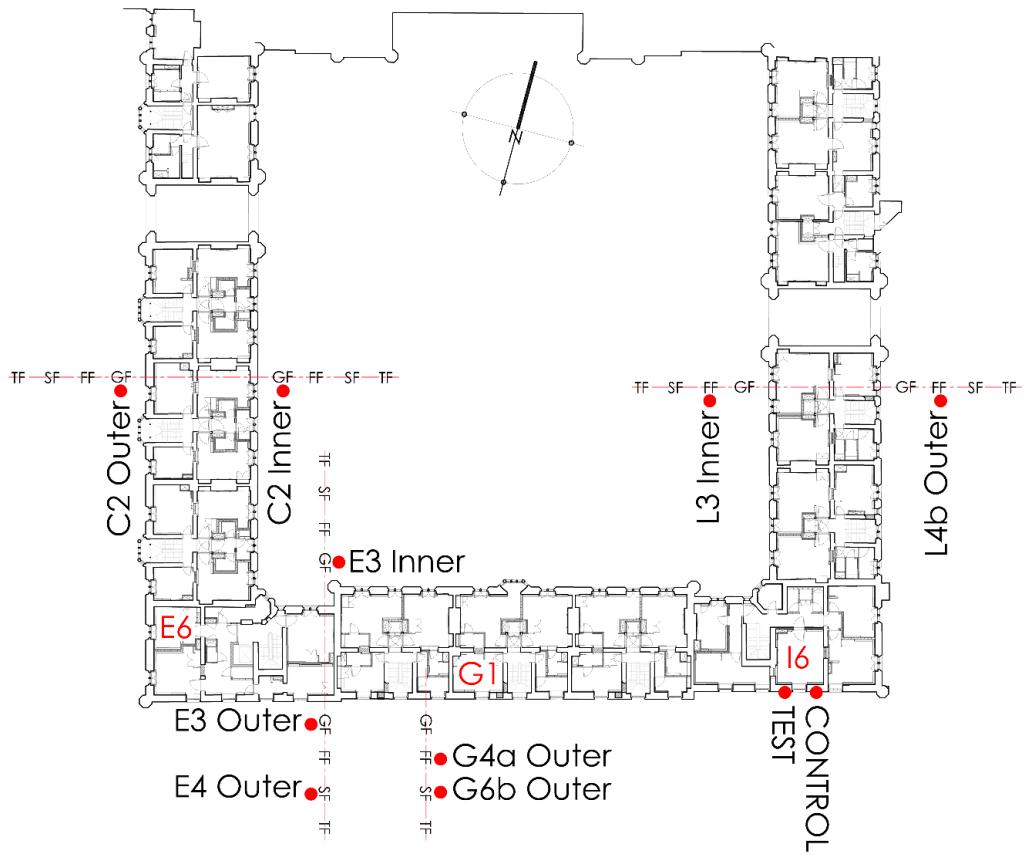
Plan of New Court, Trinity College, Cambridge showing location of monitoring rooms.
